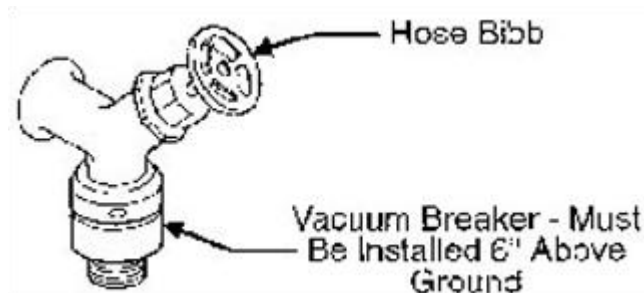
A hose connection vacuum breaker is installed by threading it onto the hose bibb. It must be located at least 6 inches above the
